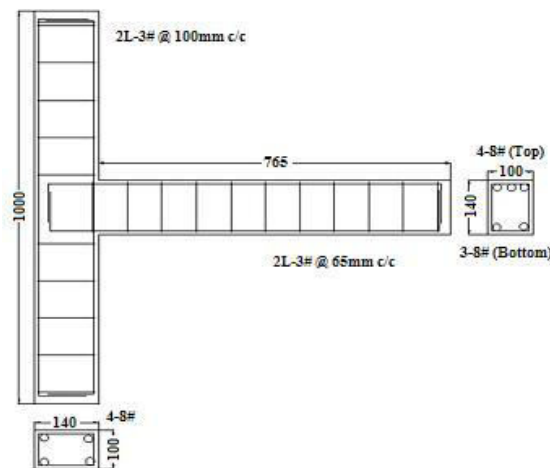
DETAILING OF CONTROL SPECIMEN AS PER IS 456:2000
